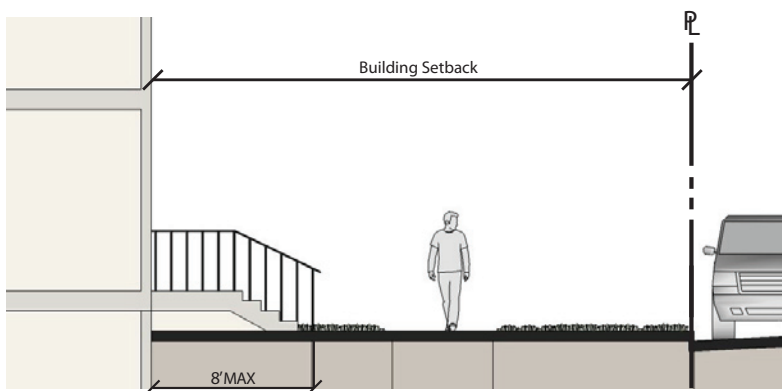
Spine Street: Stairways, Front Stoeps, & Ramps
